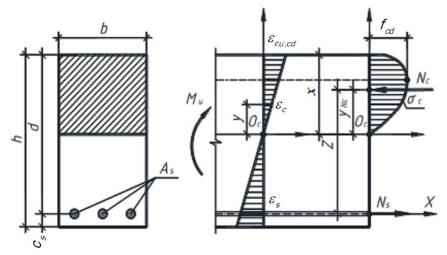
The design diagram of the normal section of flexural RCS of rectangular profile with a single reinforcement [4]
